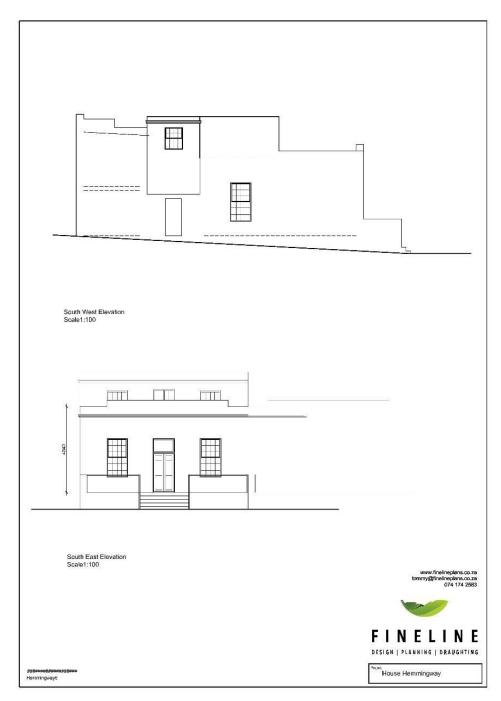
ARCHITECTURAL DESIGN PROPOSALS
